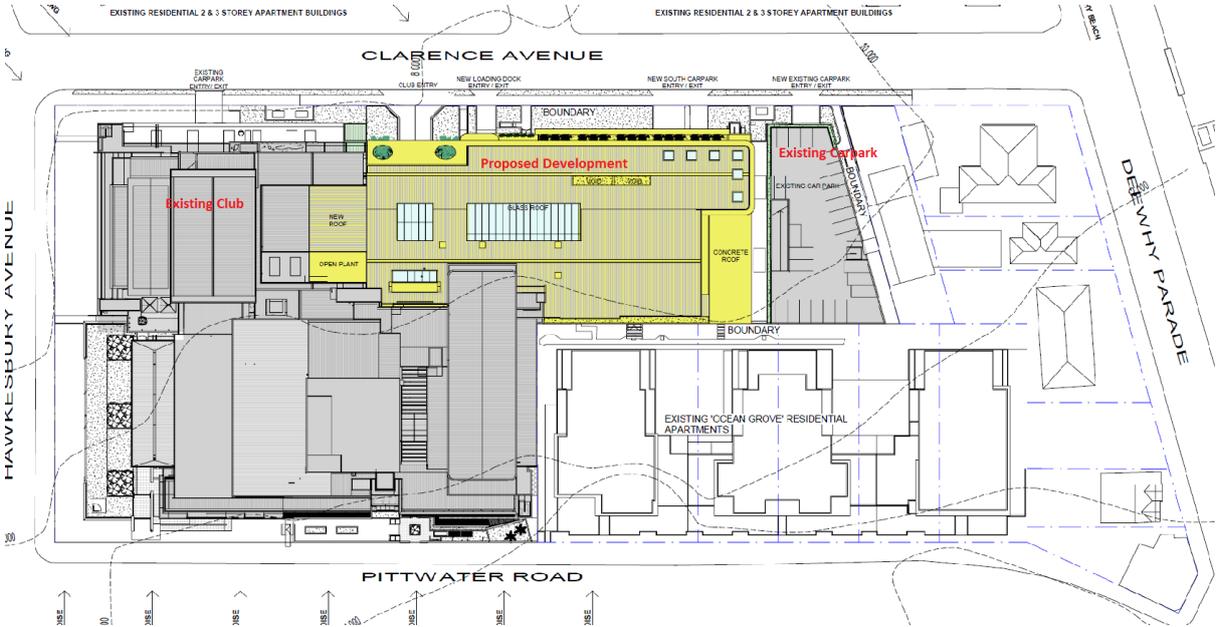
Showing the proposed footprint of the development (Source: Altis Architects)
